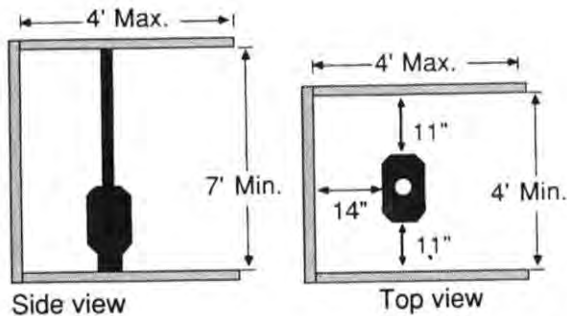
, Alcove installation (requires double wall Type L Chimney connector)
